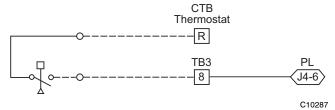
PremierLink Wiring Fan Pressure Switch Connection
